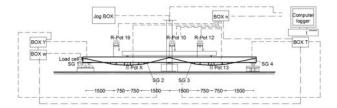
Acquisition scheme – Statically indeterminate beam and external tendons
